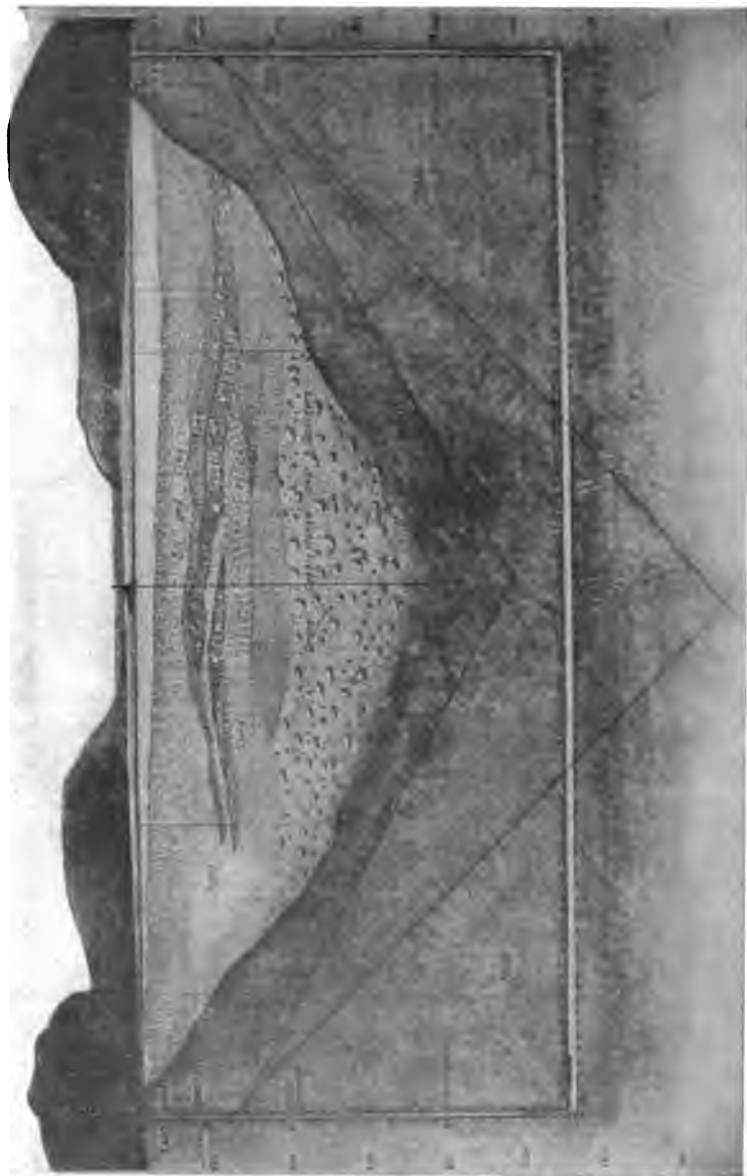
Pictorial Cross-section of Hudson River at Aqueduct Crossing between Storm King and Breakneck Mountains. Shows Position of Pressure Tunnel, Inclined and Vertical Borings and Materials Encountered in Borings and Tunnel.
